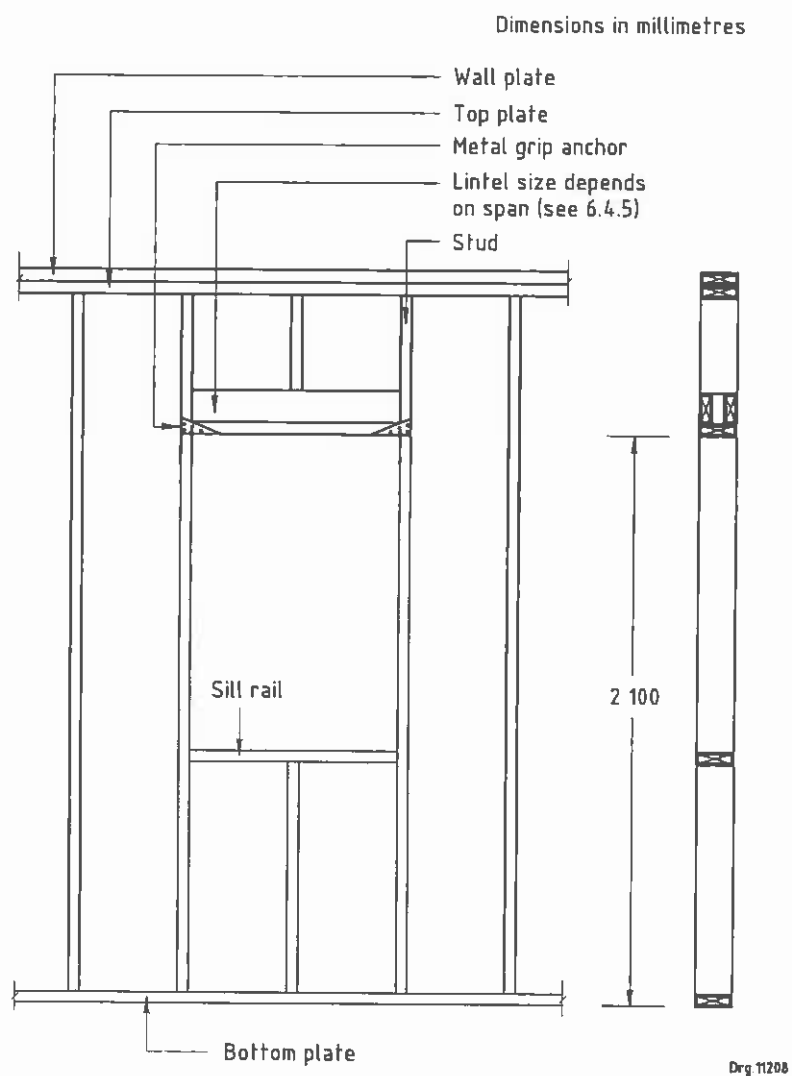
Framing around external wall opening with lintel supported by metal frame anchors
